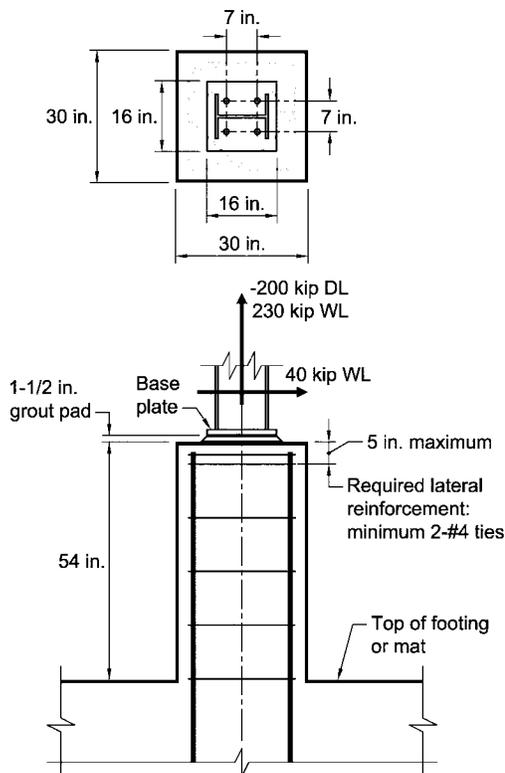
Example 13: Group of tension anchors on a pier with shear lug.
